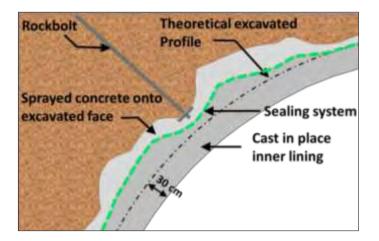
Inner lining with cast-in-place concrete (double-shell lining).
